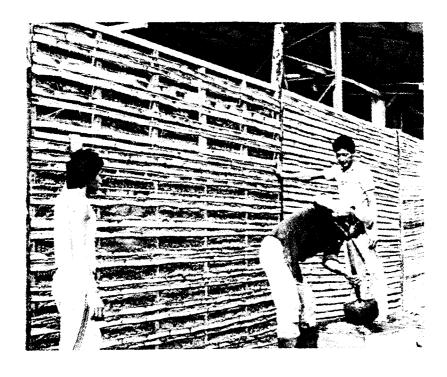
Students from the Architectural School of Laica University building a frame of braided bamboo cables for use in a concrete beam.
